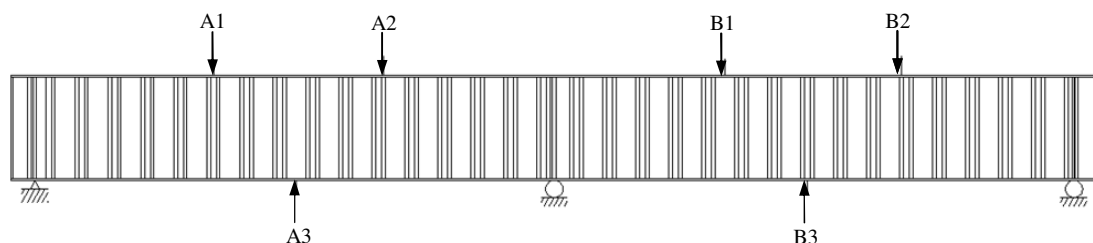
An illustration showing the tested girder and the load cases. Tests with load cases A1, A2, B1 and B2 were initially carried out and the girder was subsequently flipped upside-down enabling the two remaining tests to be performed. Total girder length: 6 m.
